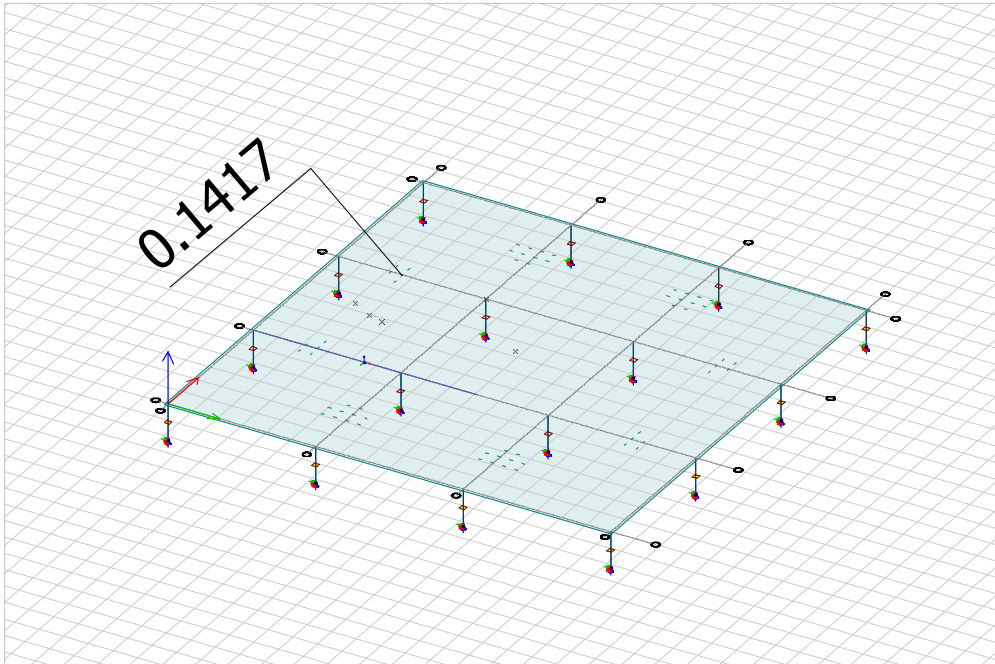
Cracking considered - RC shell - Crack width - bottom - Load comb.: SLSq - [mm]
